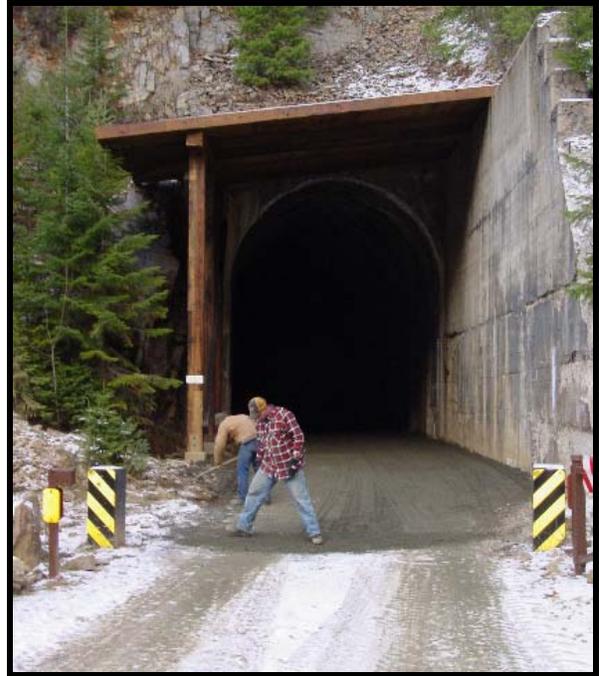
Precast concrete vertical post footings and replacing trail surface crushed aggregate.
